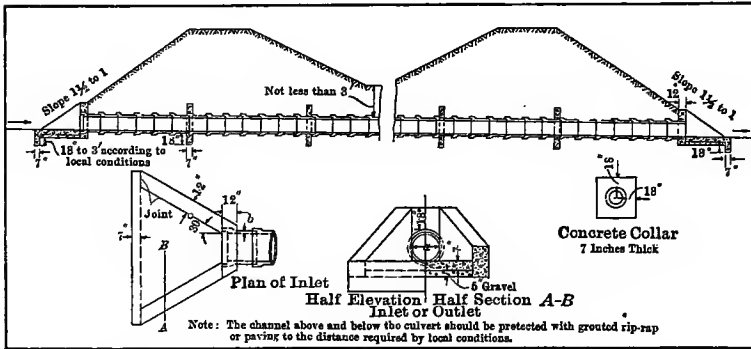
Vitrified pipe culvert with concrete inlet and outlet.
